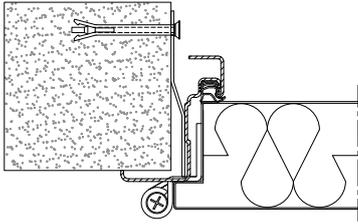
Indirect installation with steel plates - opening frame without a thermal break
